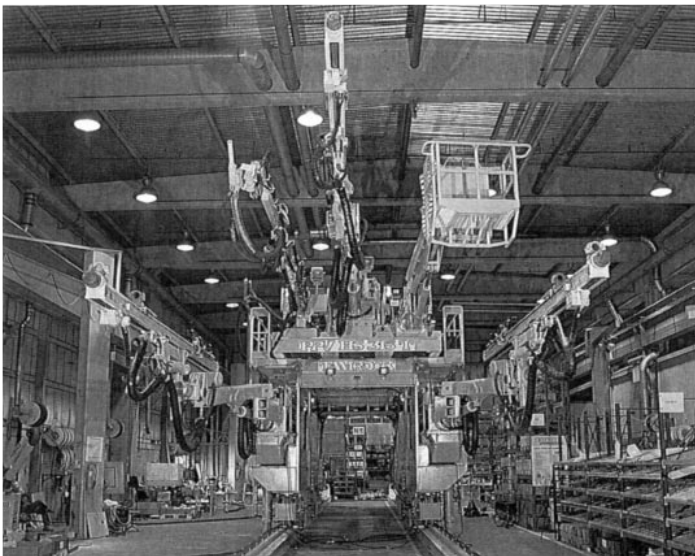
21. Rail-mounted portal-type drilling rig
